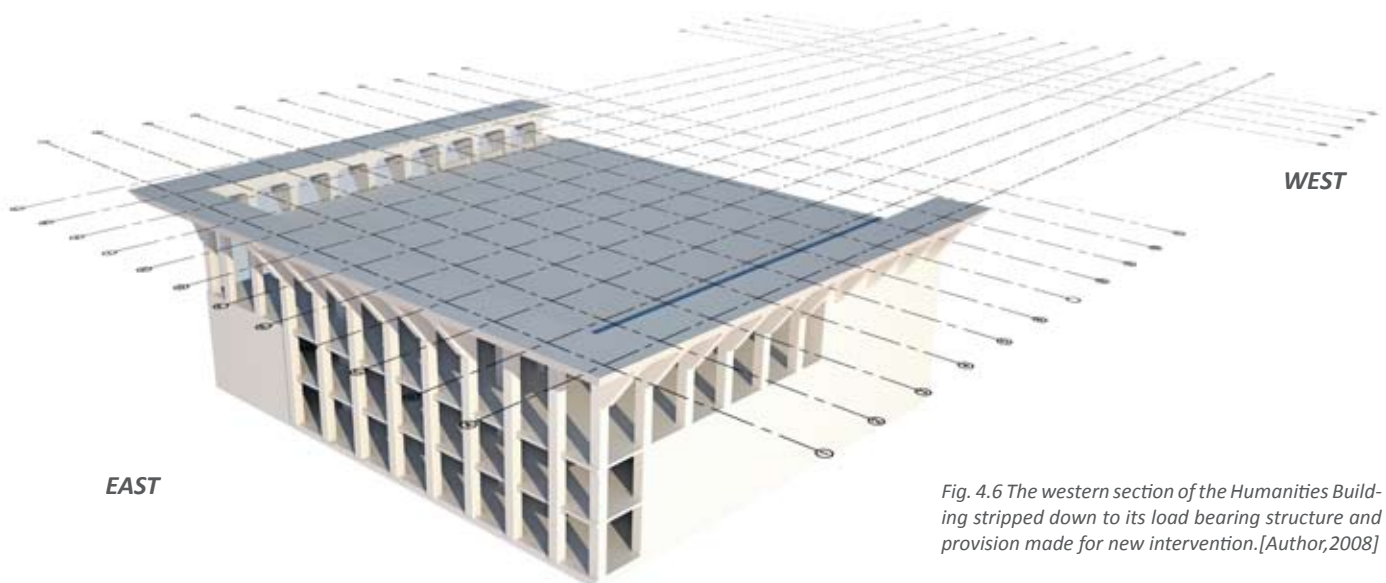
The western section of the Humanities Building stripped down to its load bearing structure and provision made for new intervention. [Author,2008]
